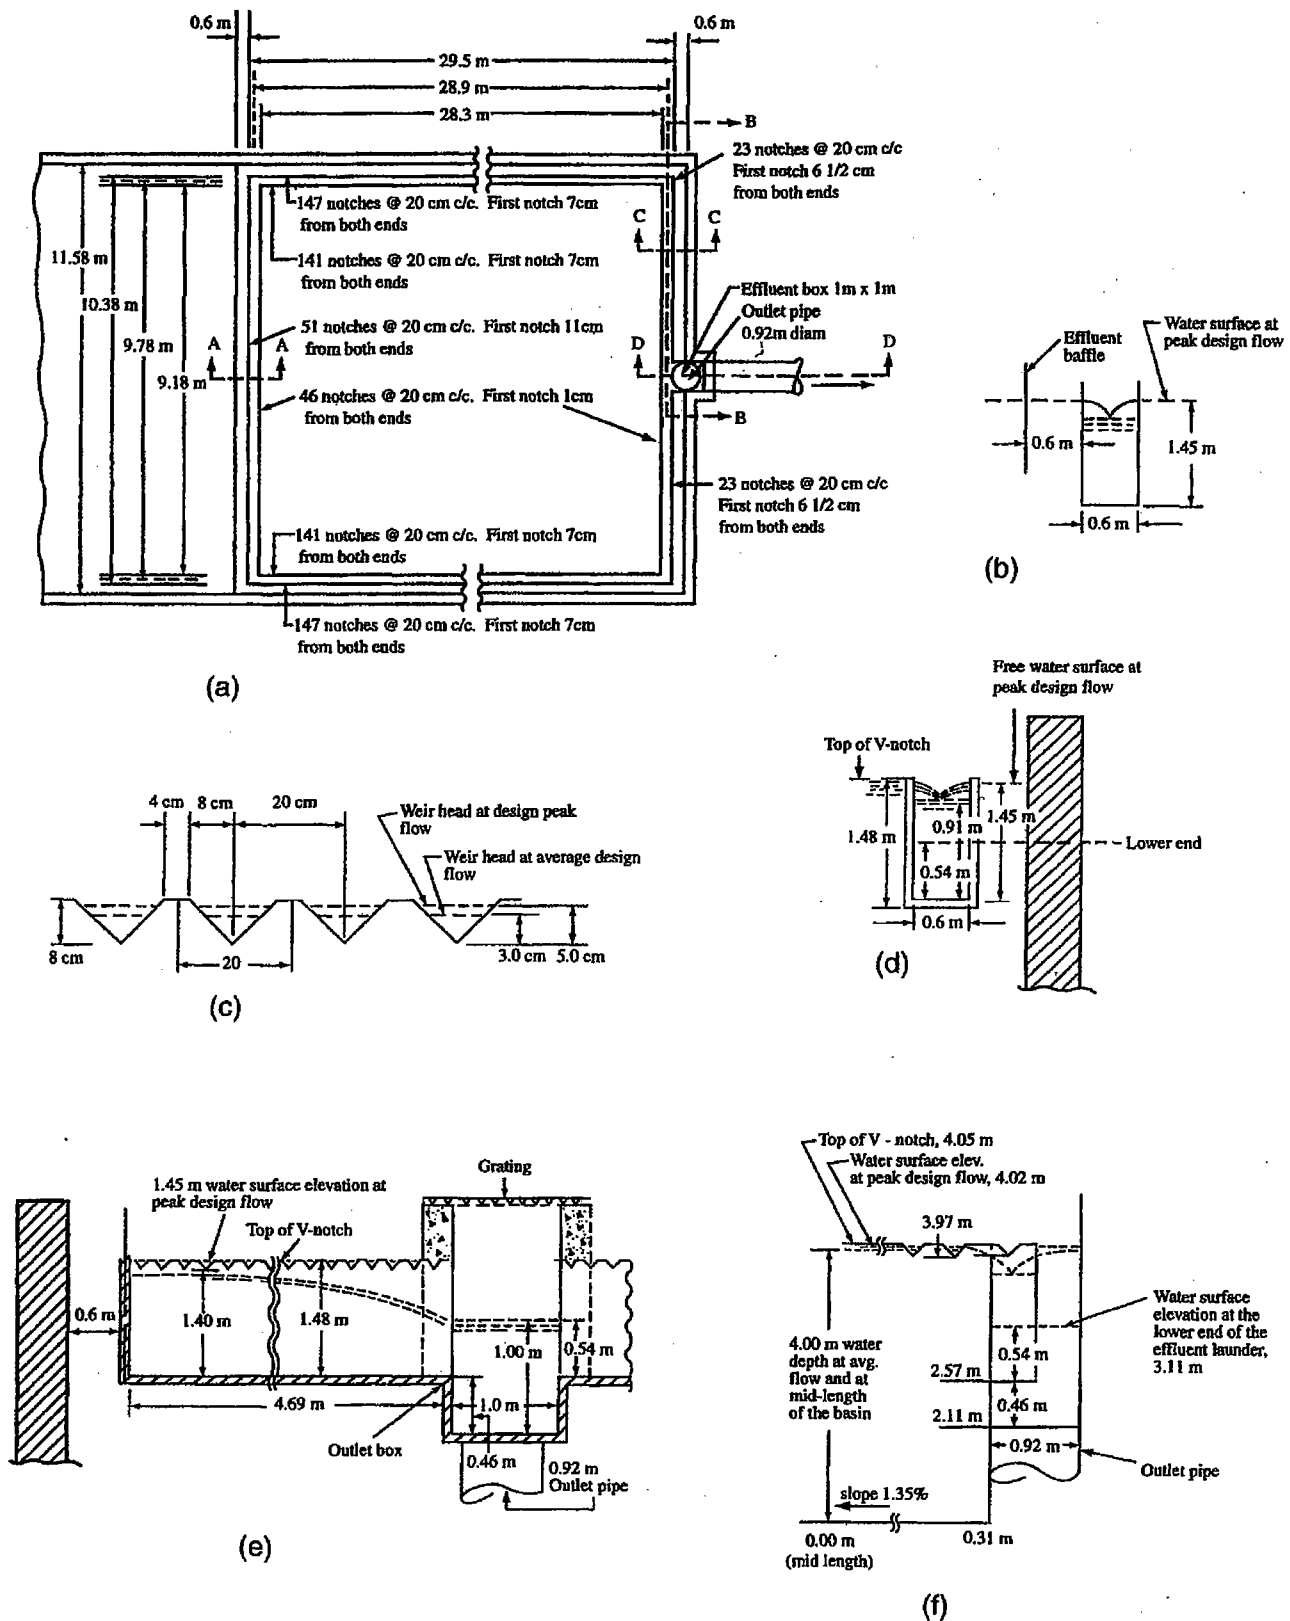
Weir Arrangement and Design Dimensions of the Effluent Structure: (a) plan view, weir arrangement; (b) section AA, weir trough (effluent launder) with weir notches on both sides; (c) details of the V-notches; (d) section CC, details of the effluent launder; (e) section BB, water surface profile in the effluent launder; and (f) section DD, details of the outlet channel. All Elevations Are with Respect to the Floor Level of the Basin at Midlength.
